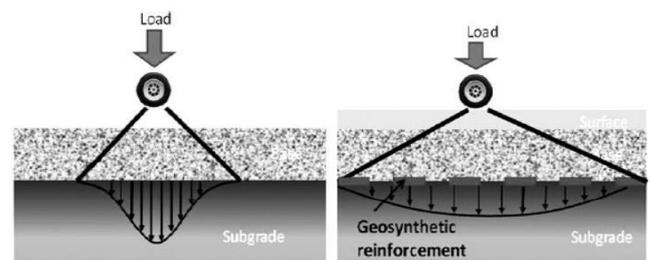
Relative load distribution at subgrade-base interface for reinforced and un-reinforced flexible pavement
